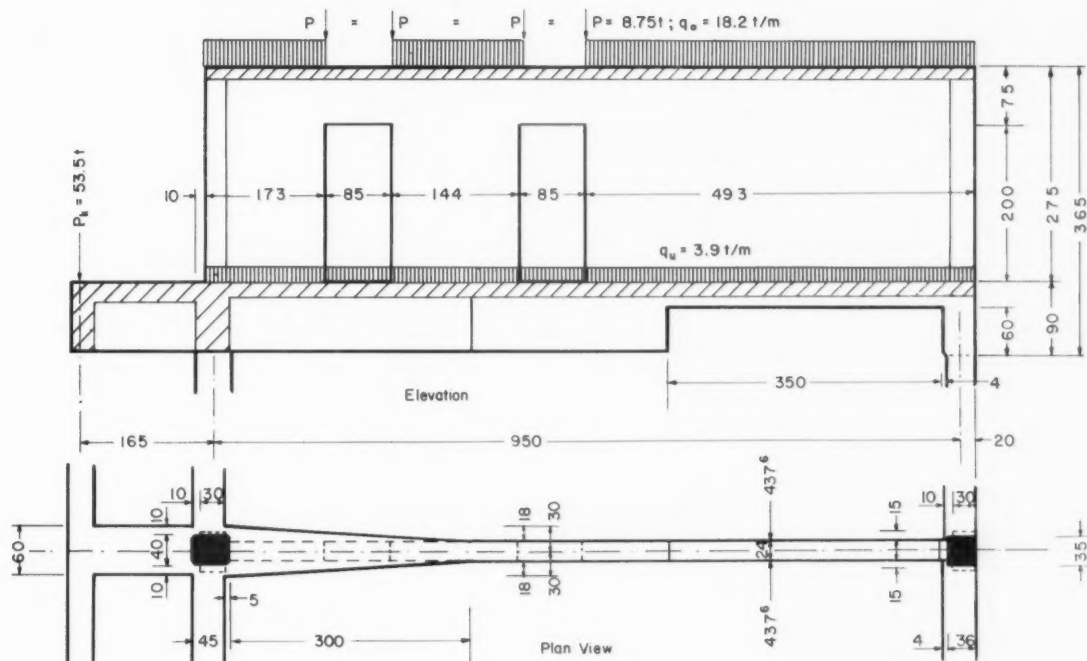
Cross section through an apartment house showing loading on ground and second story supports.
